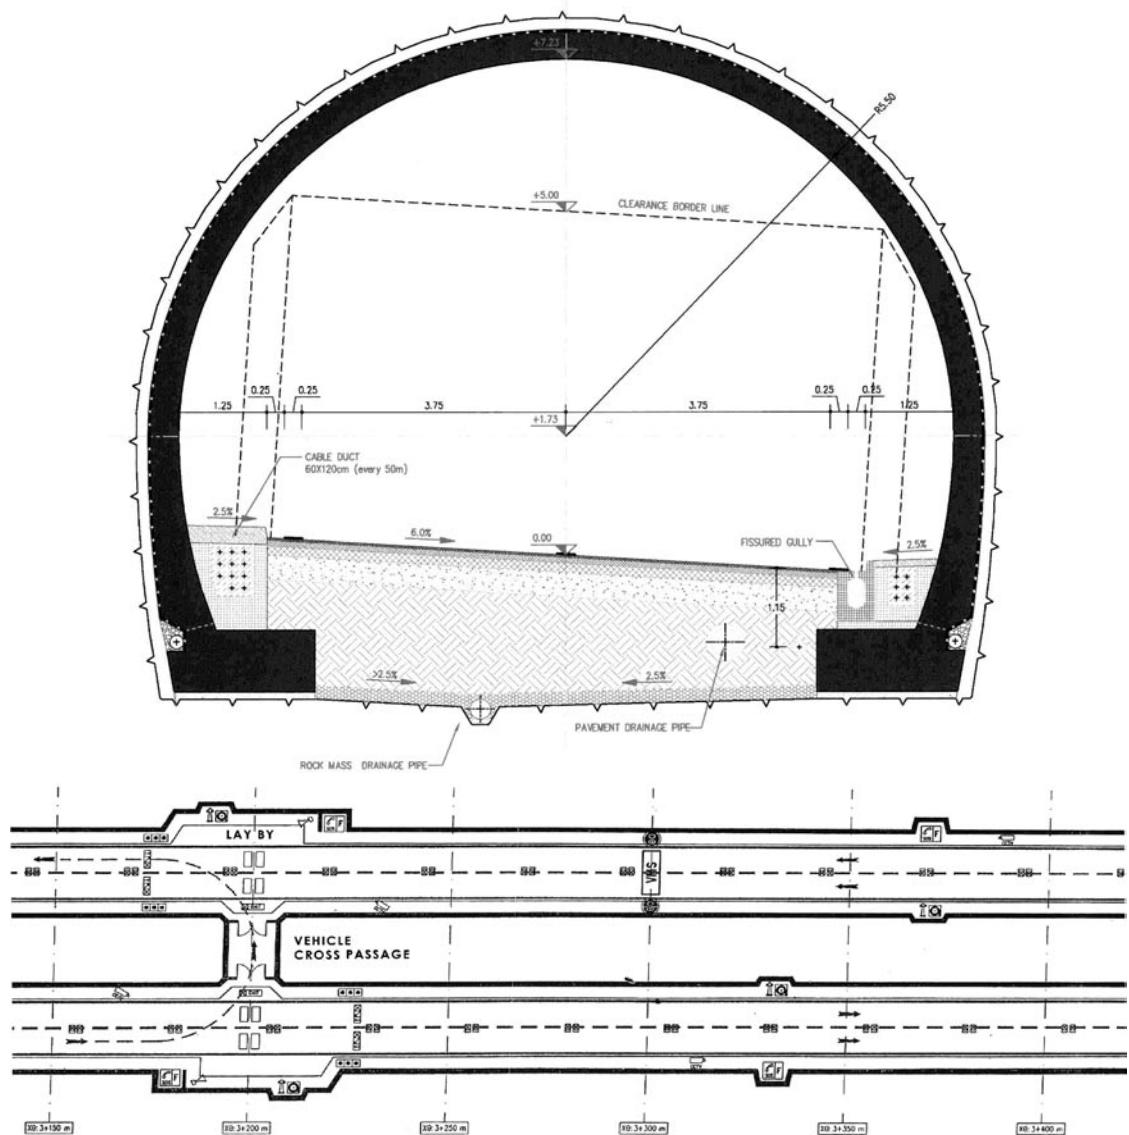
Typical Tunnel Cross-section and lay - by arrangement including emergency vehicle cross over
